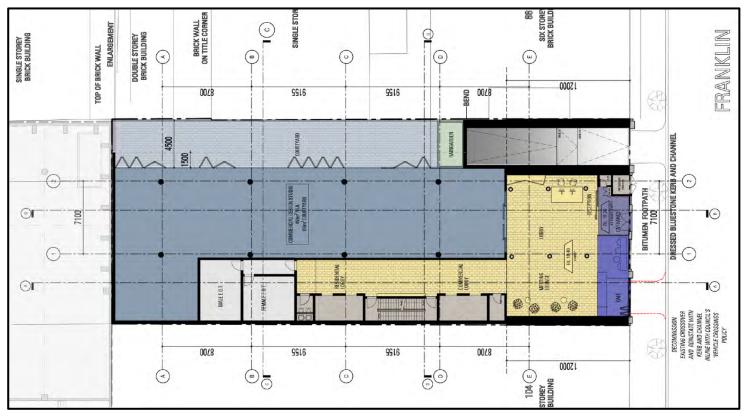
Excerpt from Drawing No. TP-100 detailing proposed ground floor layout
